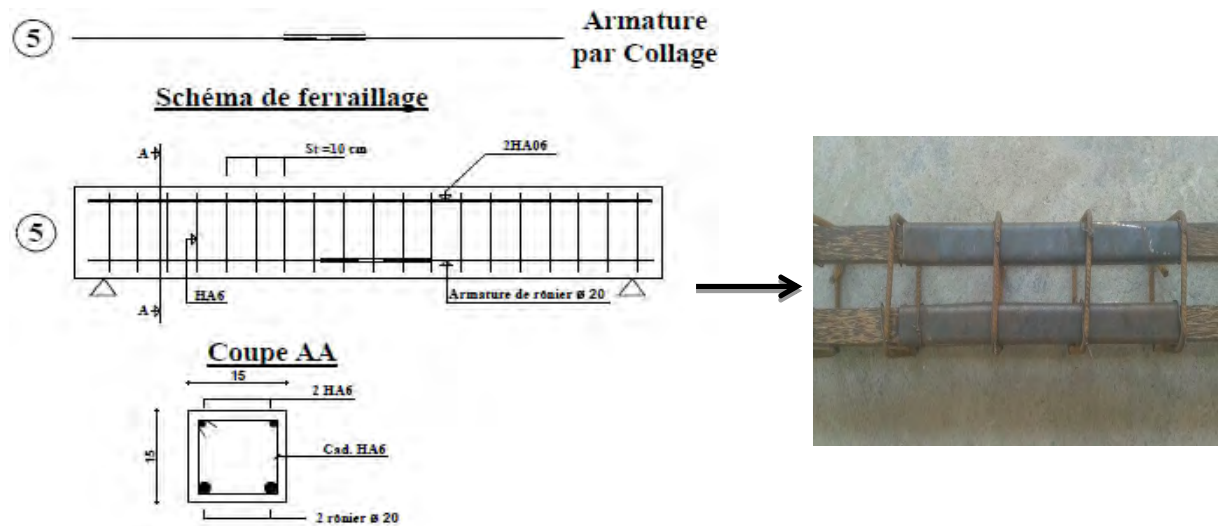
Beam reinforced with palm assembled by sticking with iron galvanized tubes in U shape
